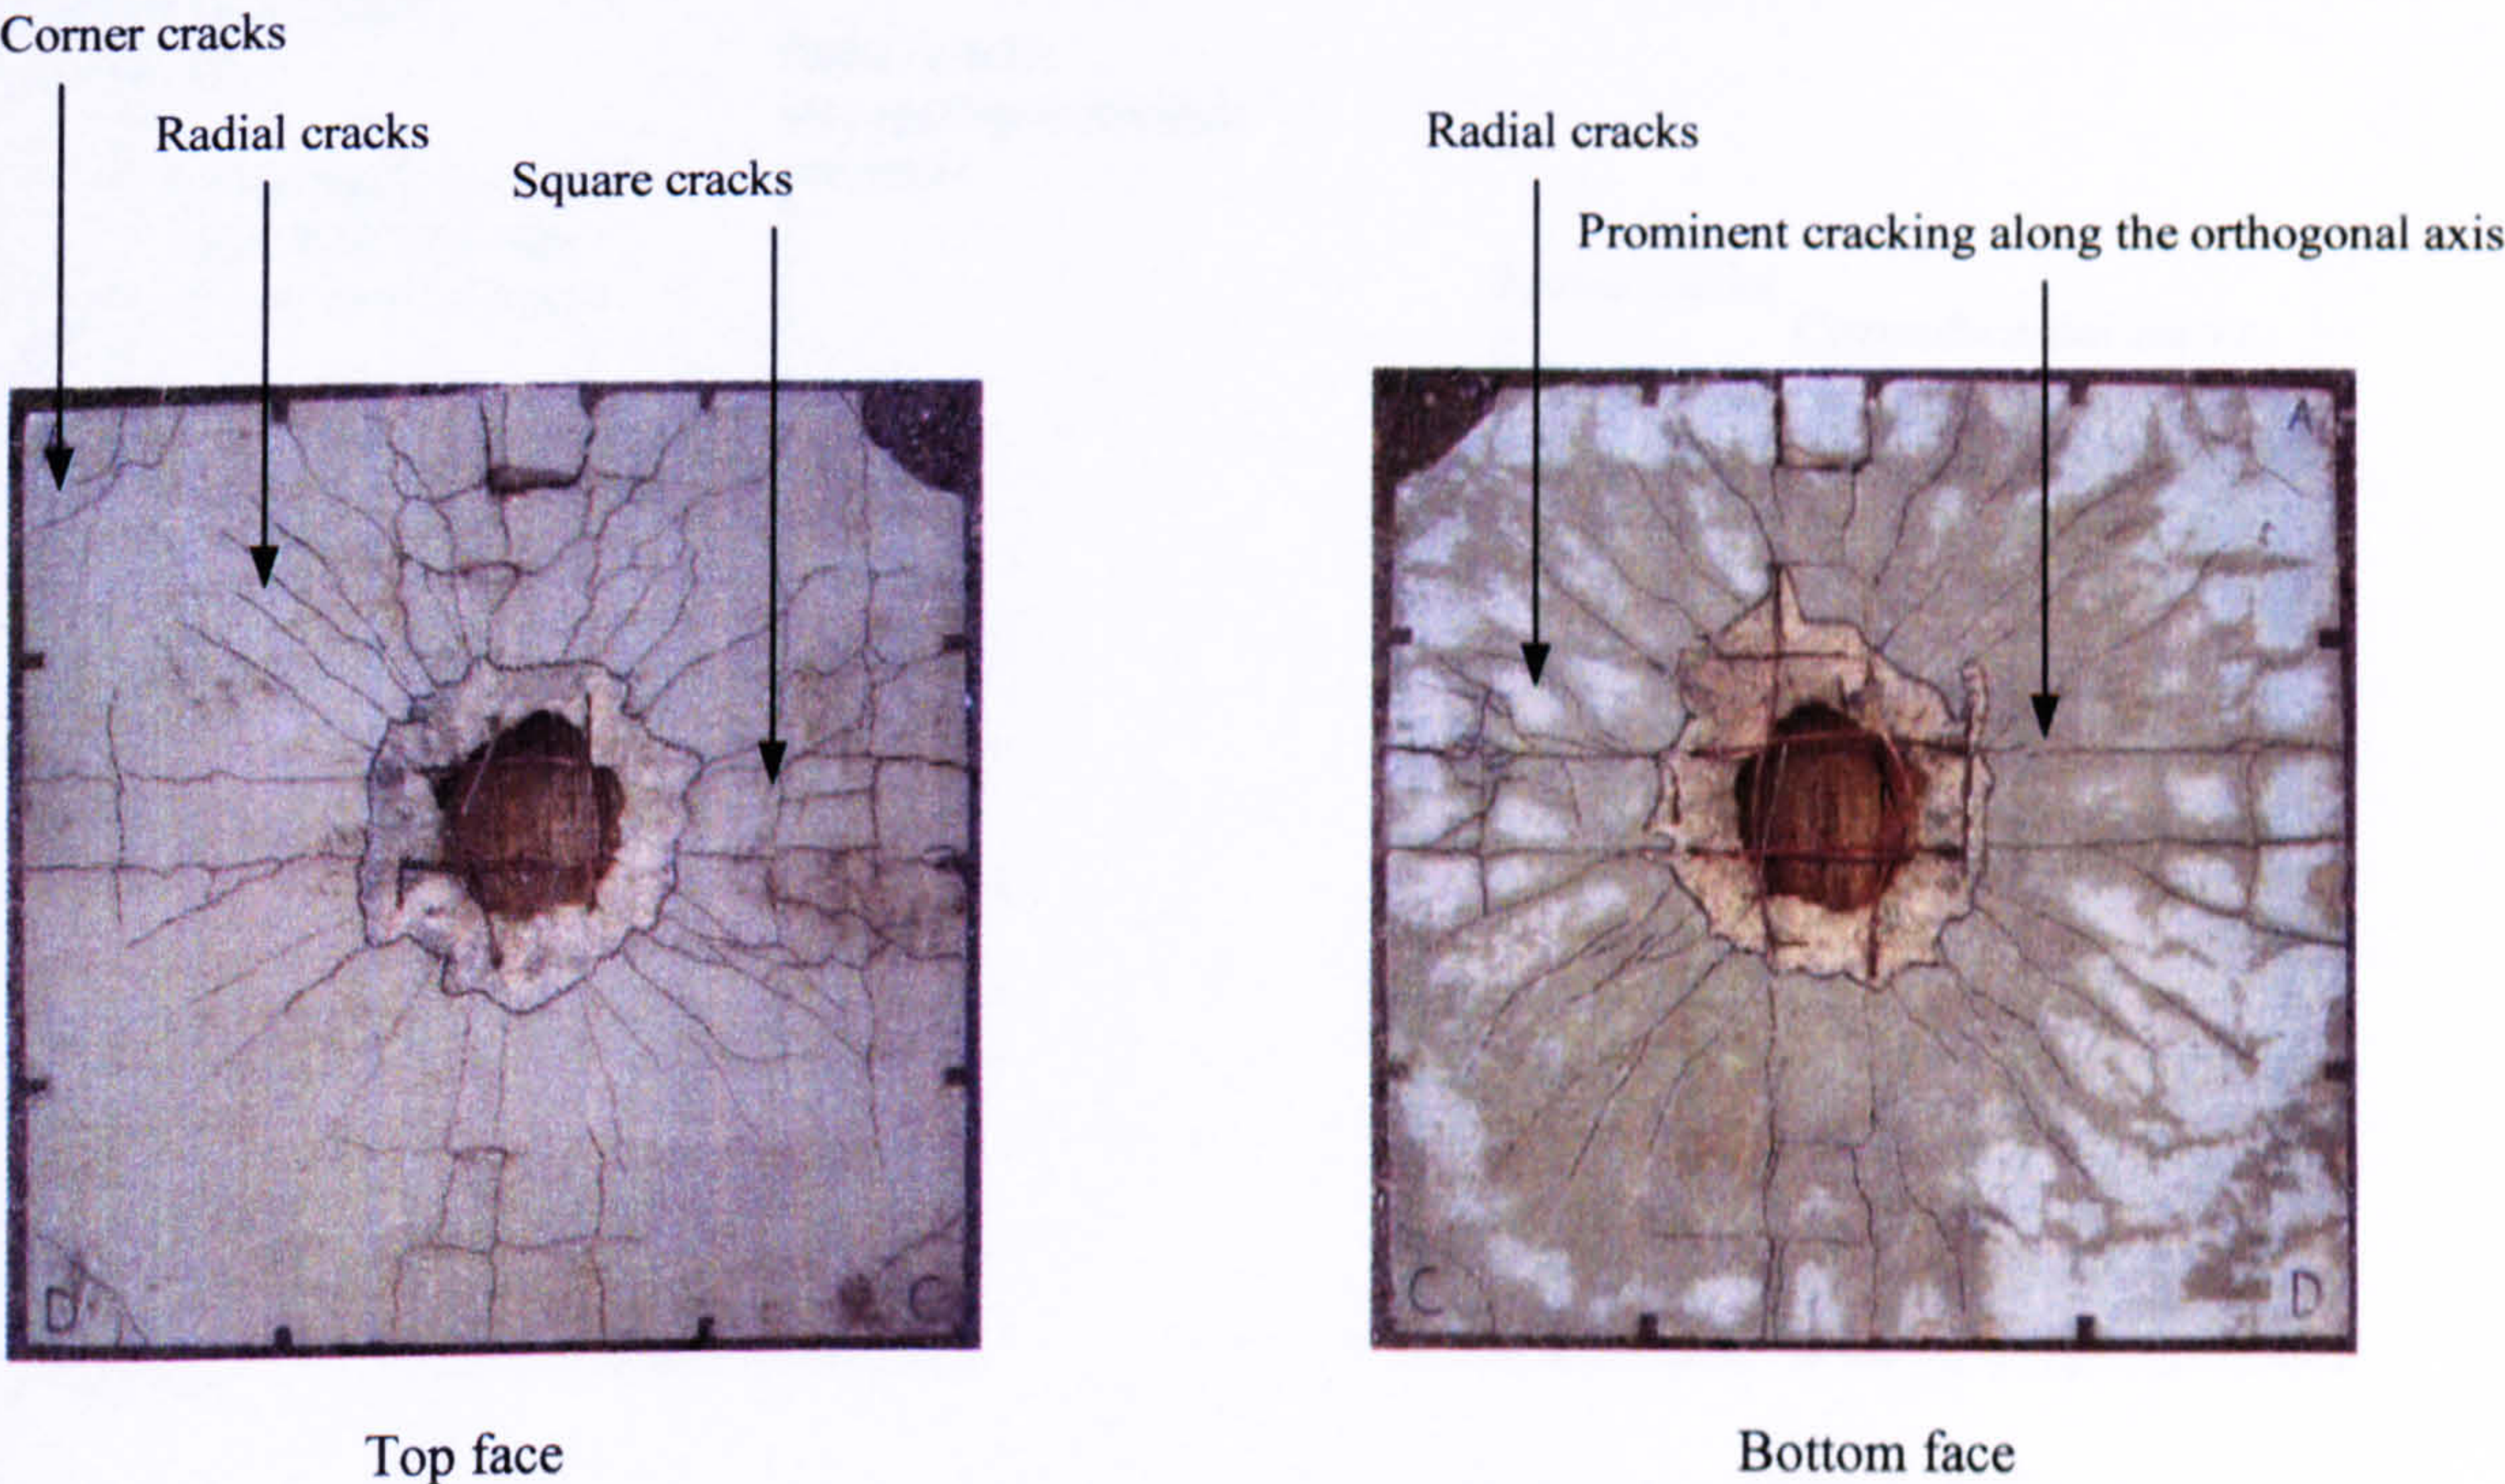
Top and bottom faces of secondary slab RCB73IT2
